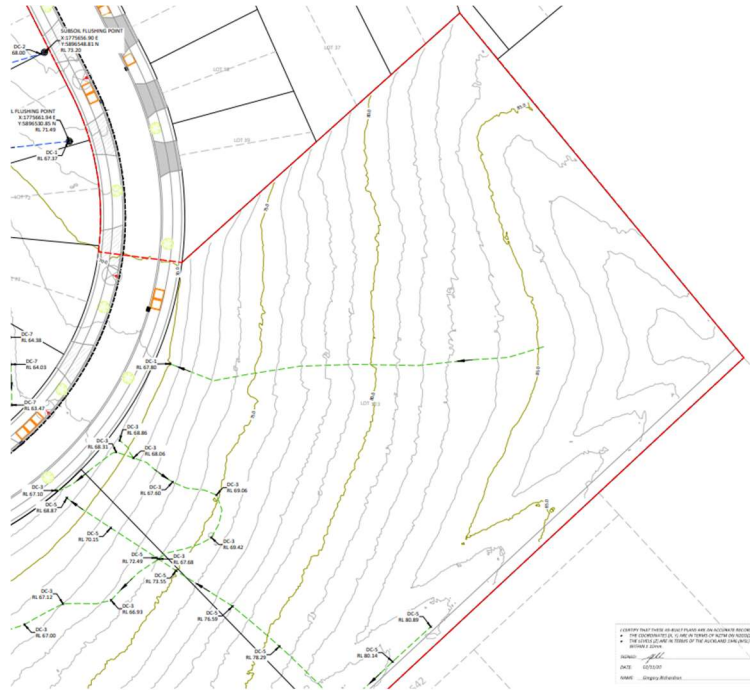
Image from Subsoil As-built plan showing historical subsoil drains across 28 Crestview Rise
